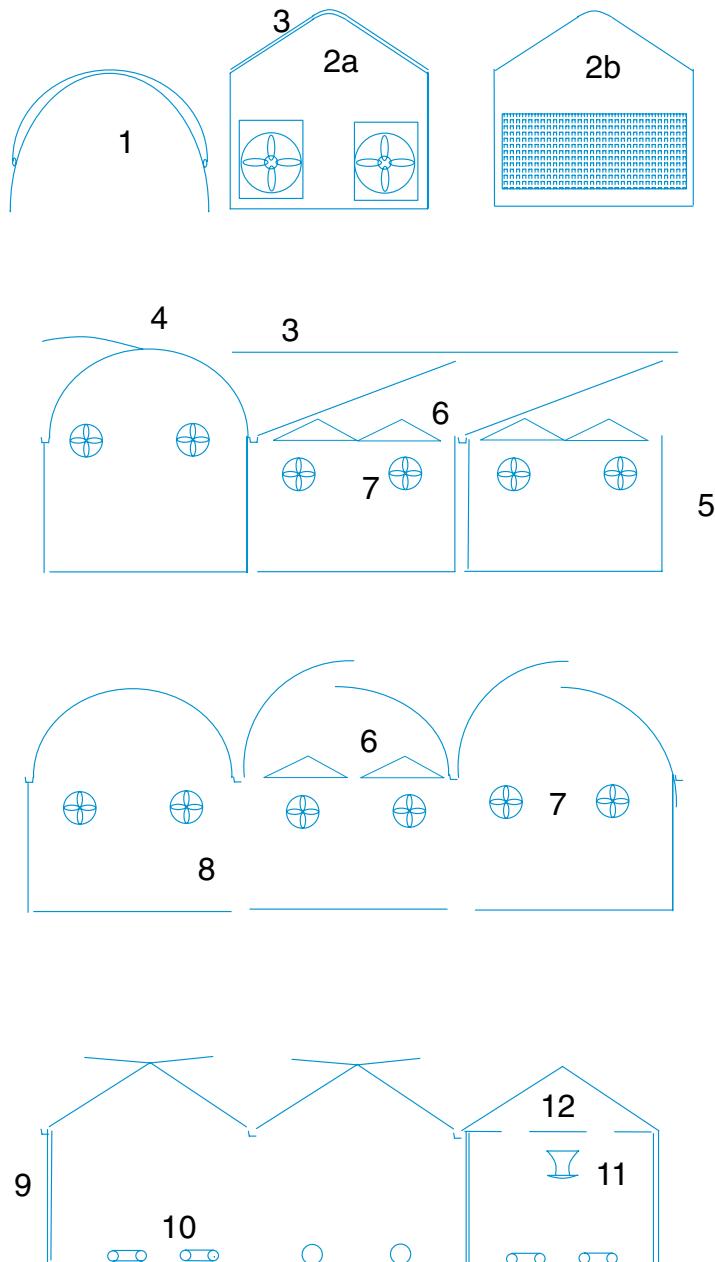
Types of greenhouse structures: 1, tunnel house with cover partially retracted for ventilation; 2, gothic arch greenhouse with fan (a) and pad (b) evaporative cooling; 3, external shade cover; 4, high tunnel with adjustable roof ventilation; 5, sawtooth greenhouses with permanent roof ventilation; 6, evaporative misting; 7, horizontal air-movement fans; 8, gutter-connected high tunnels with and without permanent ventilation; 9, Venlo-style glass or plastic greenhouse with adjustable roof with or without side ventilation; 10, heating pipes (hot water) or ducted hot air; 11, vertical air-movement fan; 12, thermal screens across roof and sides.
